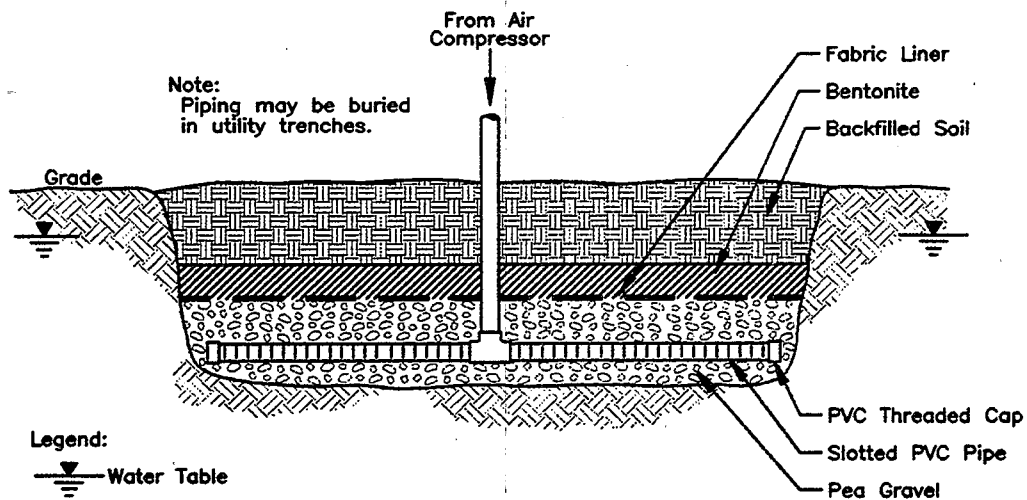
Typical Horizontal Air Sparging Well Construction
